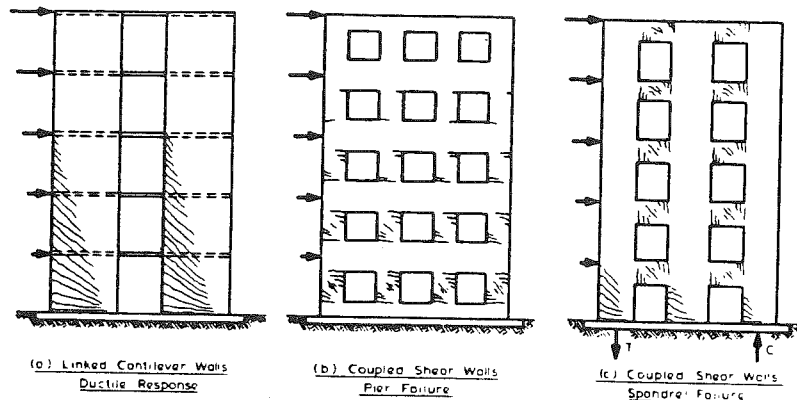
MASONRY SHEAR WALLS UNDER SEISMIC LOADING
